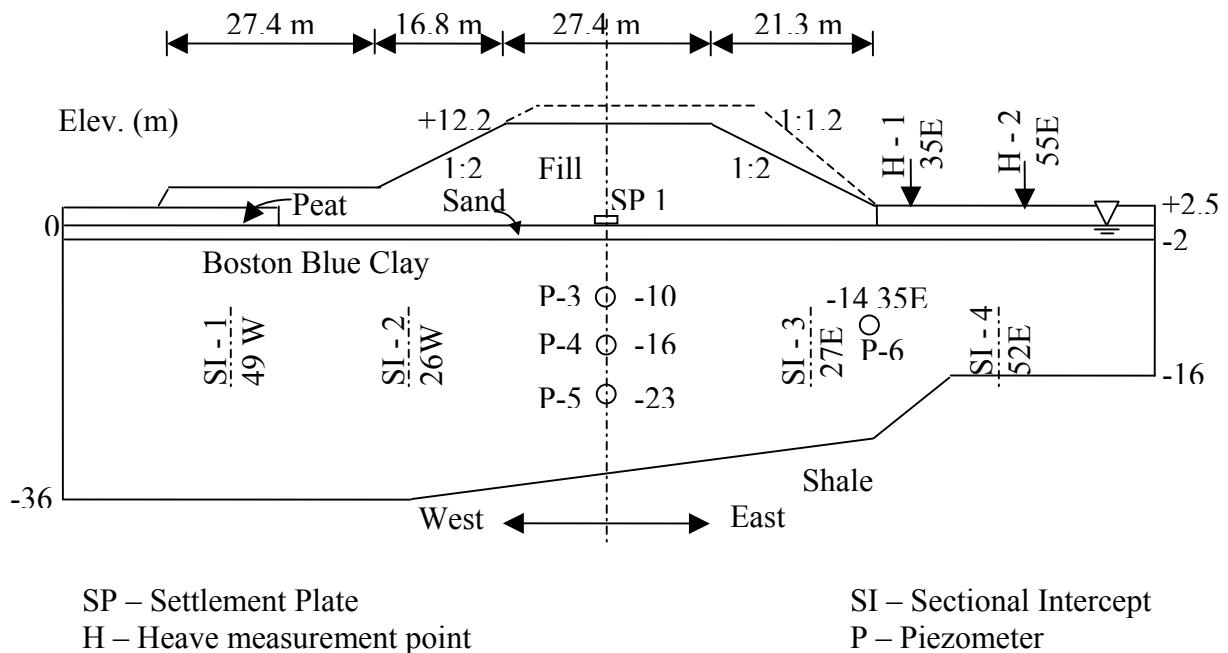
Cross section of the embankment showing ground profile and location of instruments
